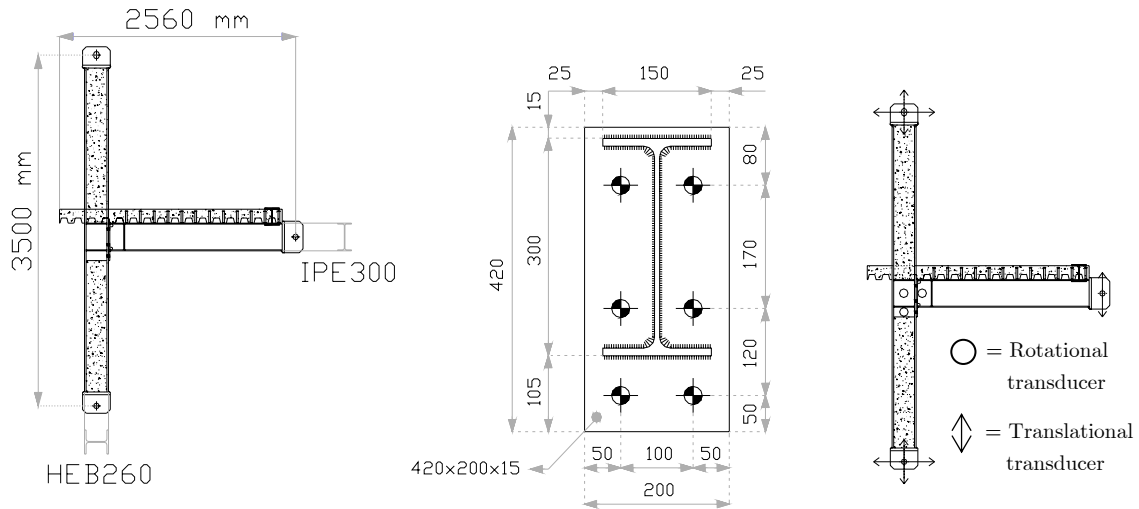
Properties (in mm) and instrumentation of the single-sided composite joint specimen
